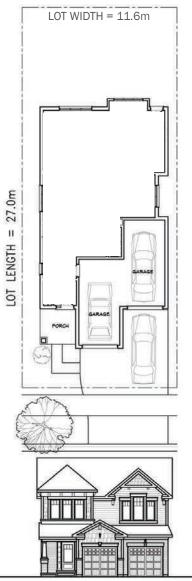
Plan View and Elevation of Staggered Garage
